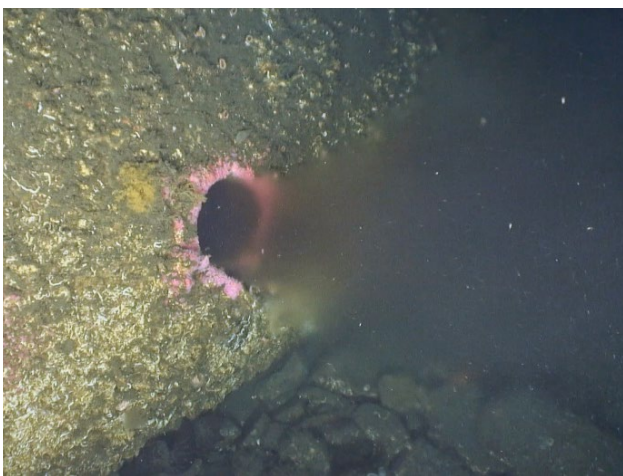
West side of j-box designed to provide an option for adding a second main barrel to the 90-inch outfall.
